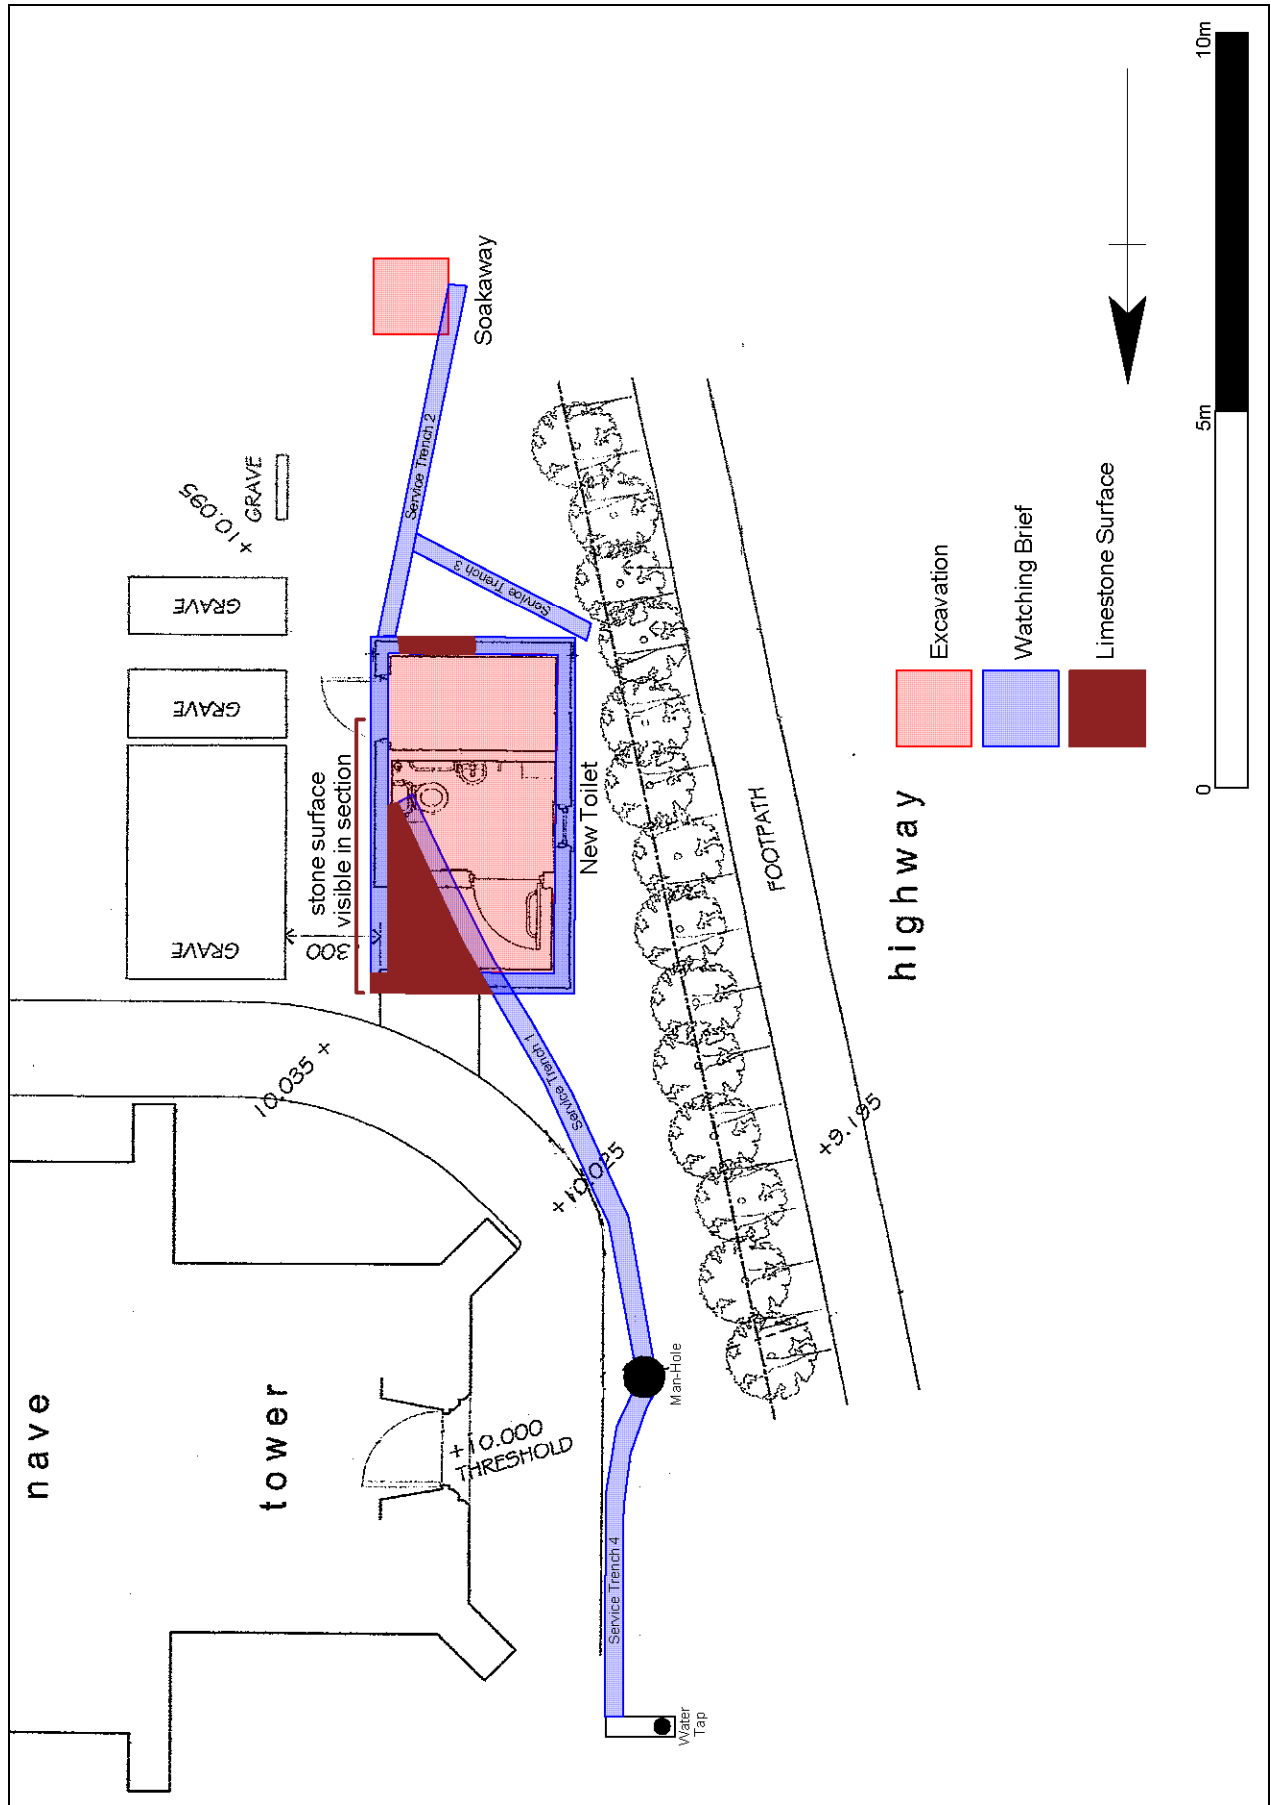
Development plan highlighting excavation and watching brief areas and limestone surface (scale 1:100)
